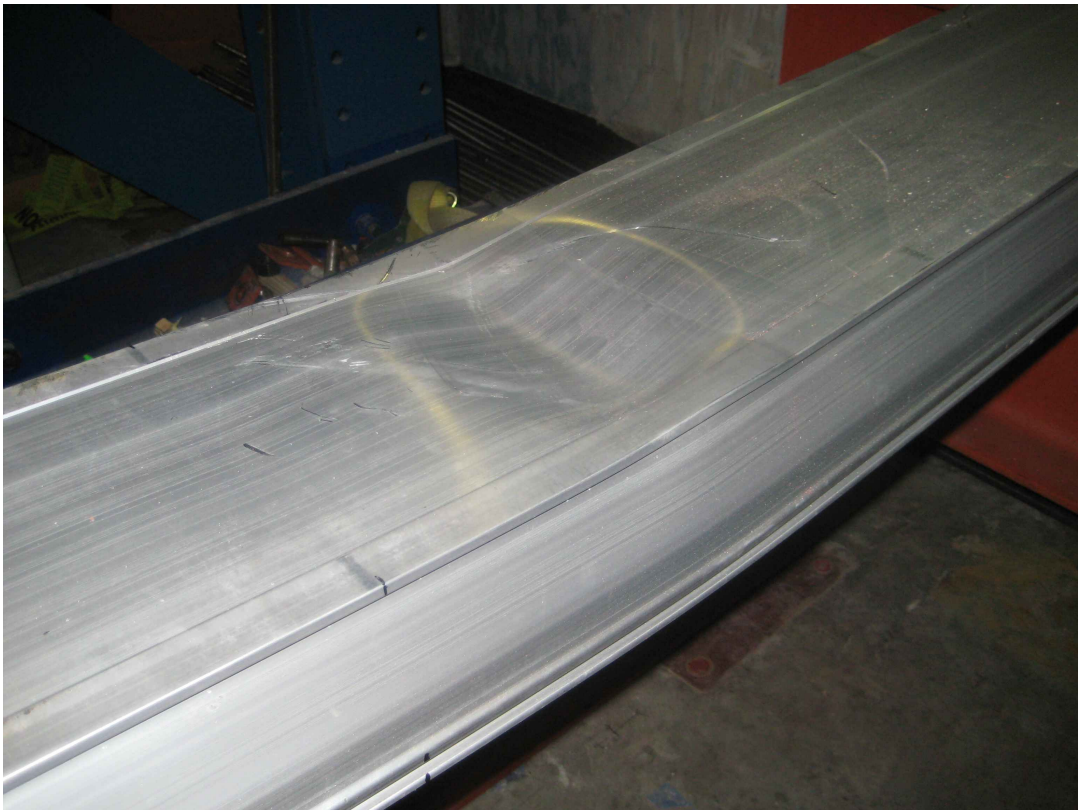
Local Flange Buckling of Inverted Panel at Failure
